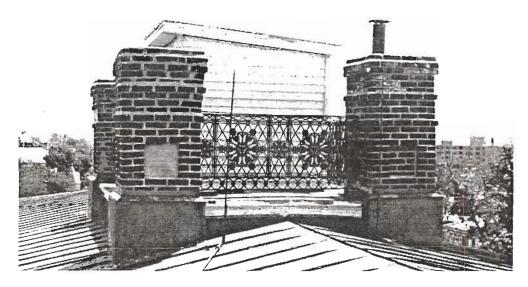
West Elevation of Chimneys and Roof Vent Structure.
